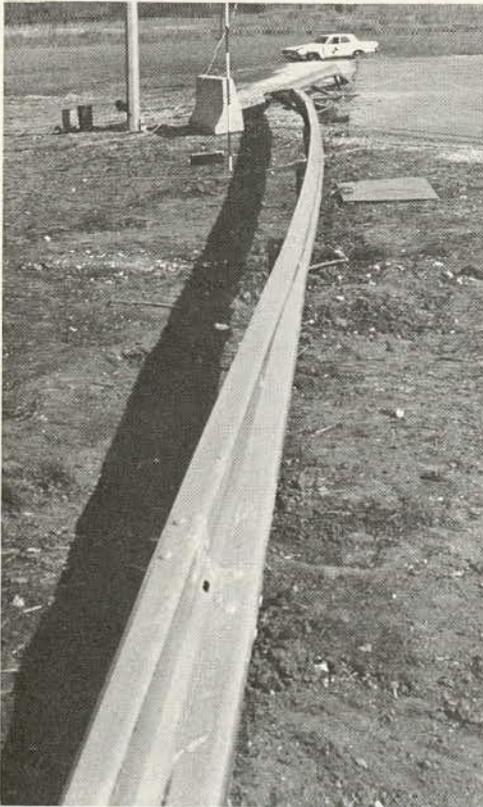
Guardrail and vehicle damage, Test 105.
